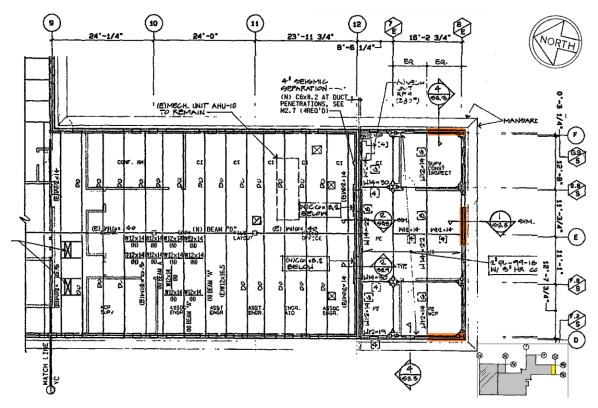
South Admin Addition – Framing Plan Showing the New Shear Walls
